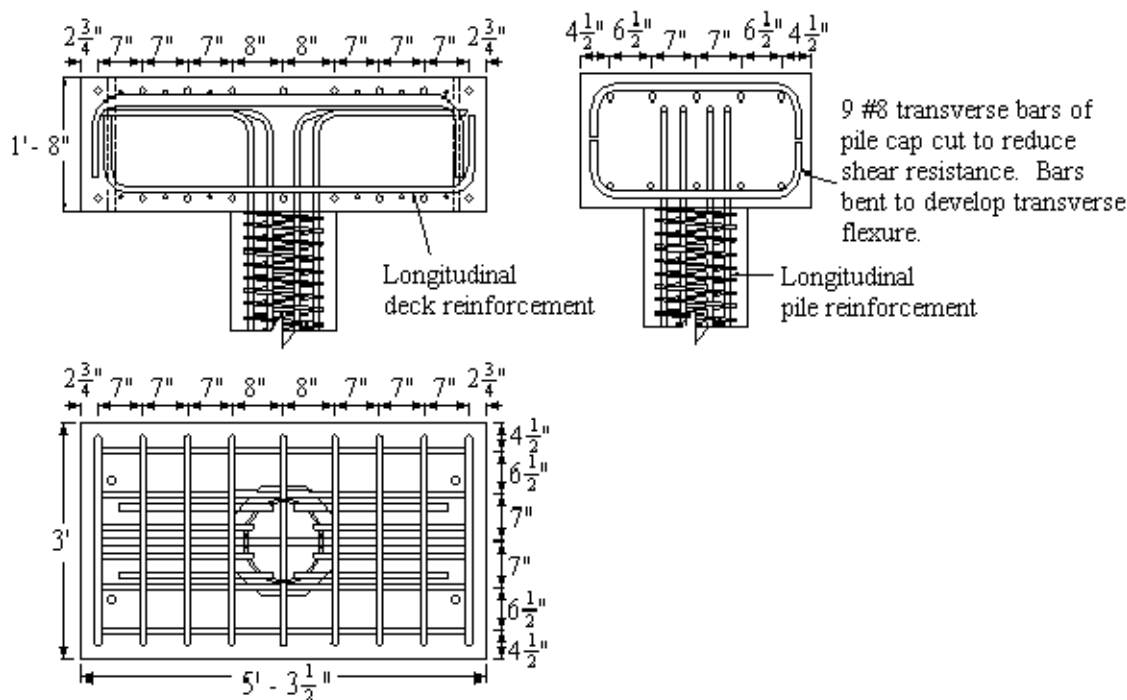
Deck Slab Section Reinforcement for Specimen 8
